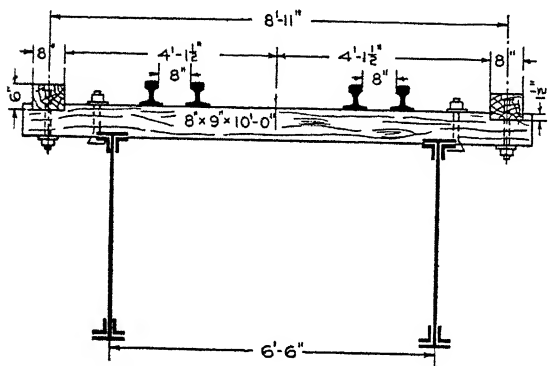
Section of Open-Floor Construction of Deck-Girder and Truss Bridge, Single Track. Lehigh Valley Standard. Plate-Girders used for Stringers
